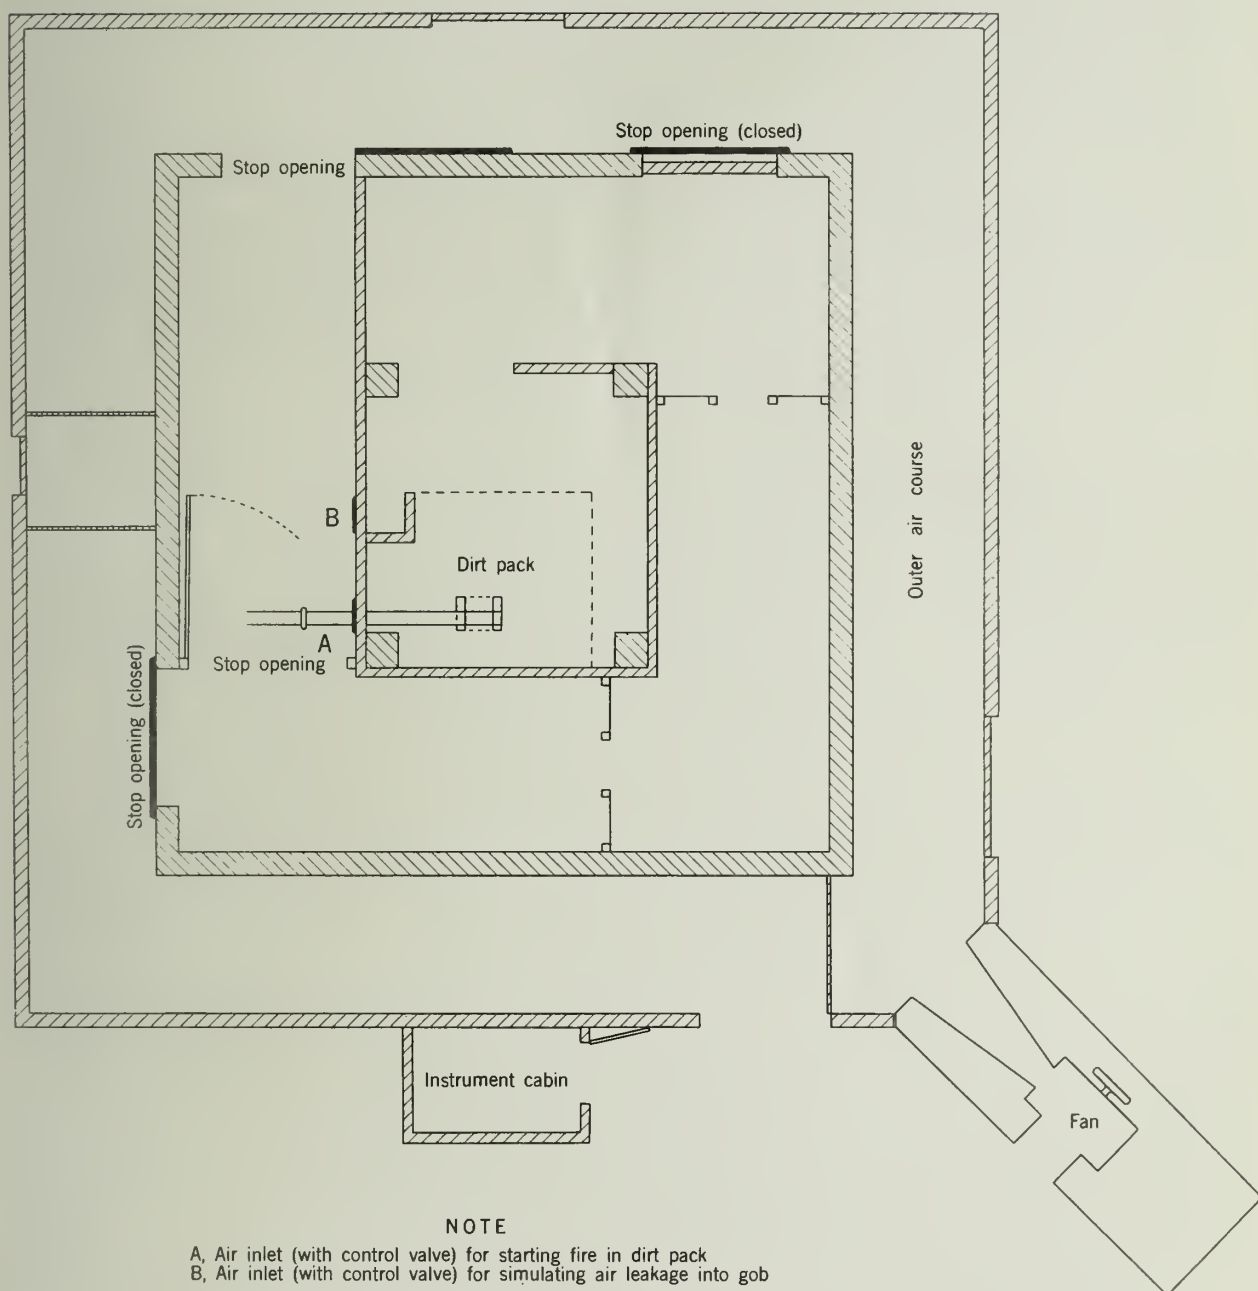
Plan of gob-fire chamber as arranged for experiment 14
